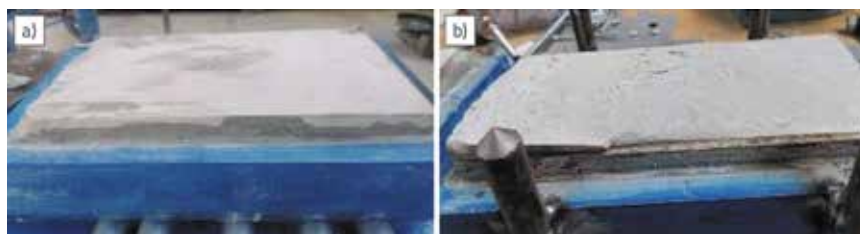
a) View of the shear surface after test on a smooth specimen; b) View of the shear surface after test on a rough specimen
